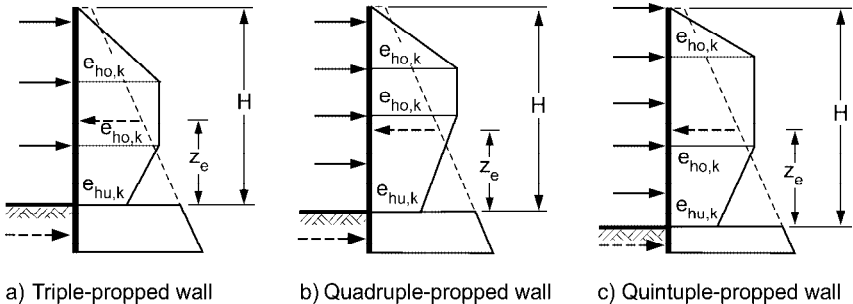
Pressure diagrams for triple- and multiple propped sheet pile walls and in-situ concrete walls
